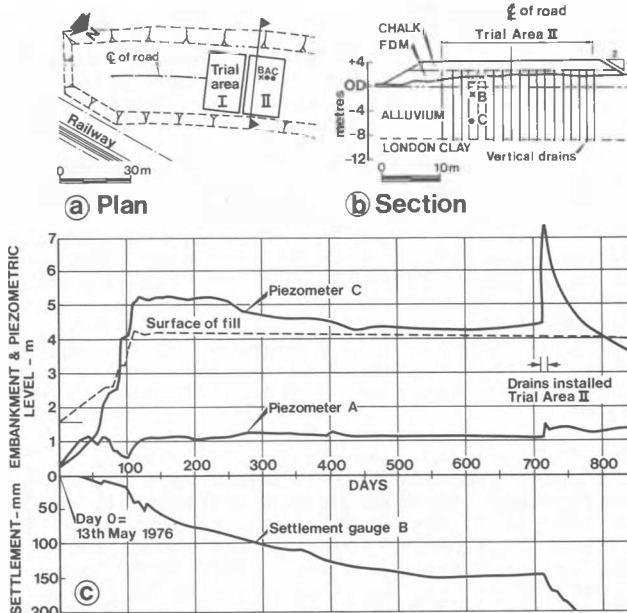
Queenborough By-Pass. a) Vertical Drain Trial layout, b) Section, c) Results
